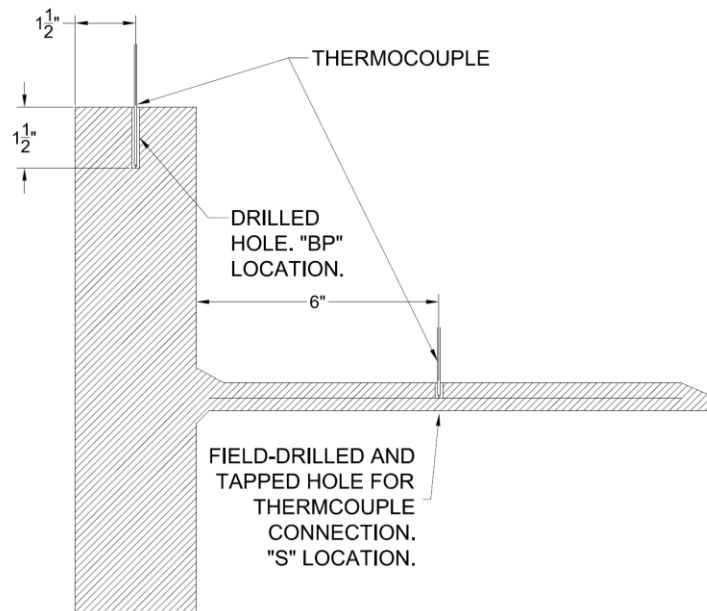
Typical thermocouple connection details for 33-3-12-TXEC-SG specimens as in section A-A of Figure 5-5
